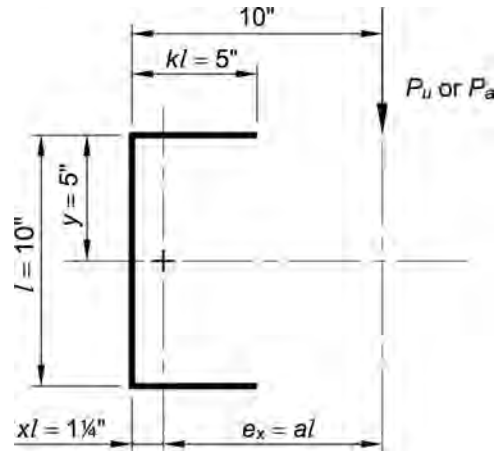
Weld geometry for Example IIA-27.
